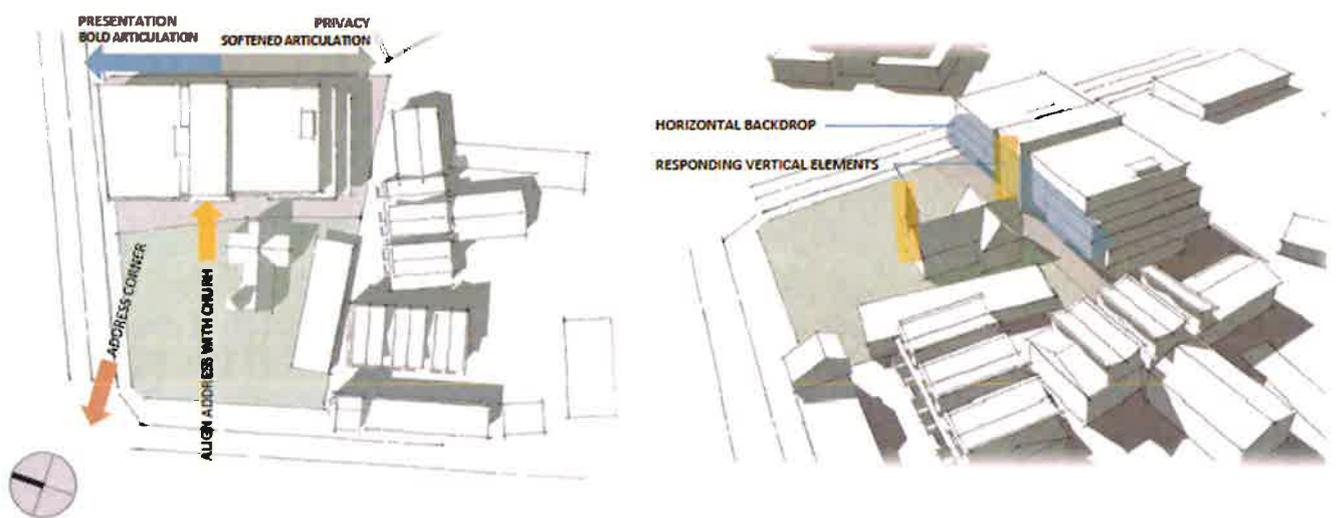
Presentation to St Matthew's Church (Source: Planning Proposal & BuiltConsult Pty Ltd)
